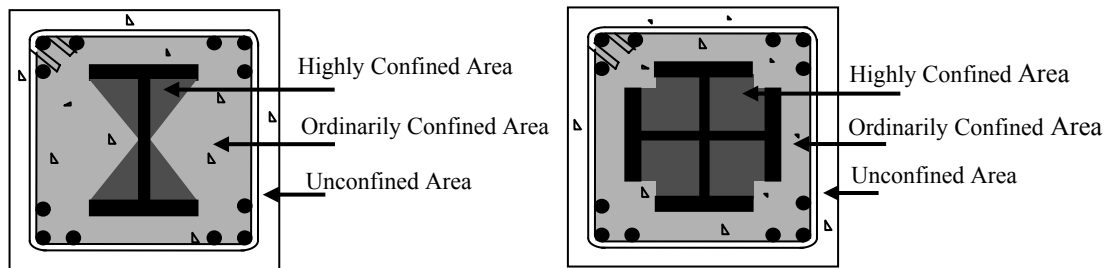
“Highly confined concrete” and “ordinarily confined concrete” in SRC columns
